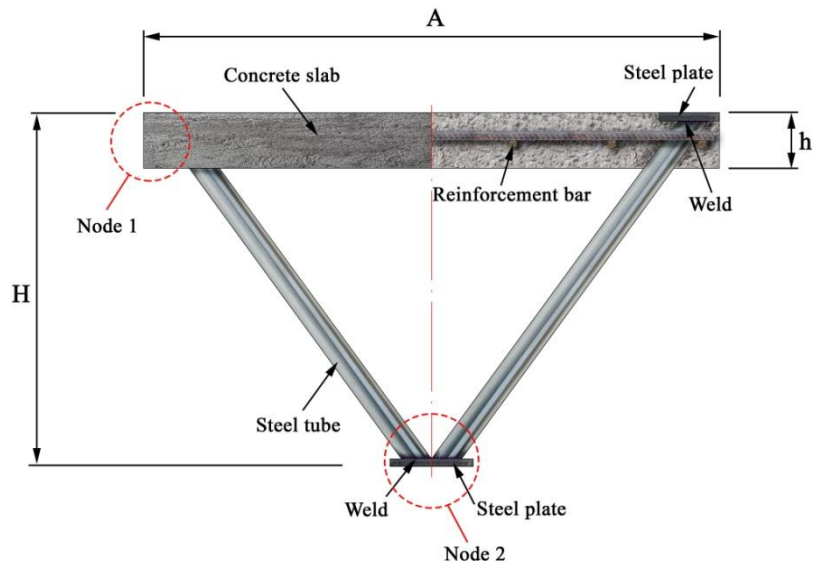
Space module of the composite steel and concrete grid-cable constructions
